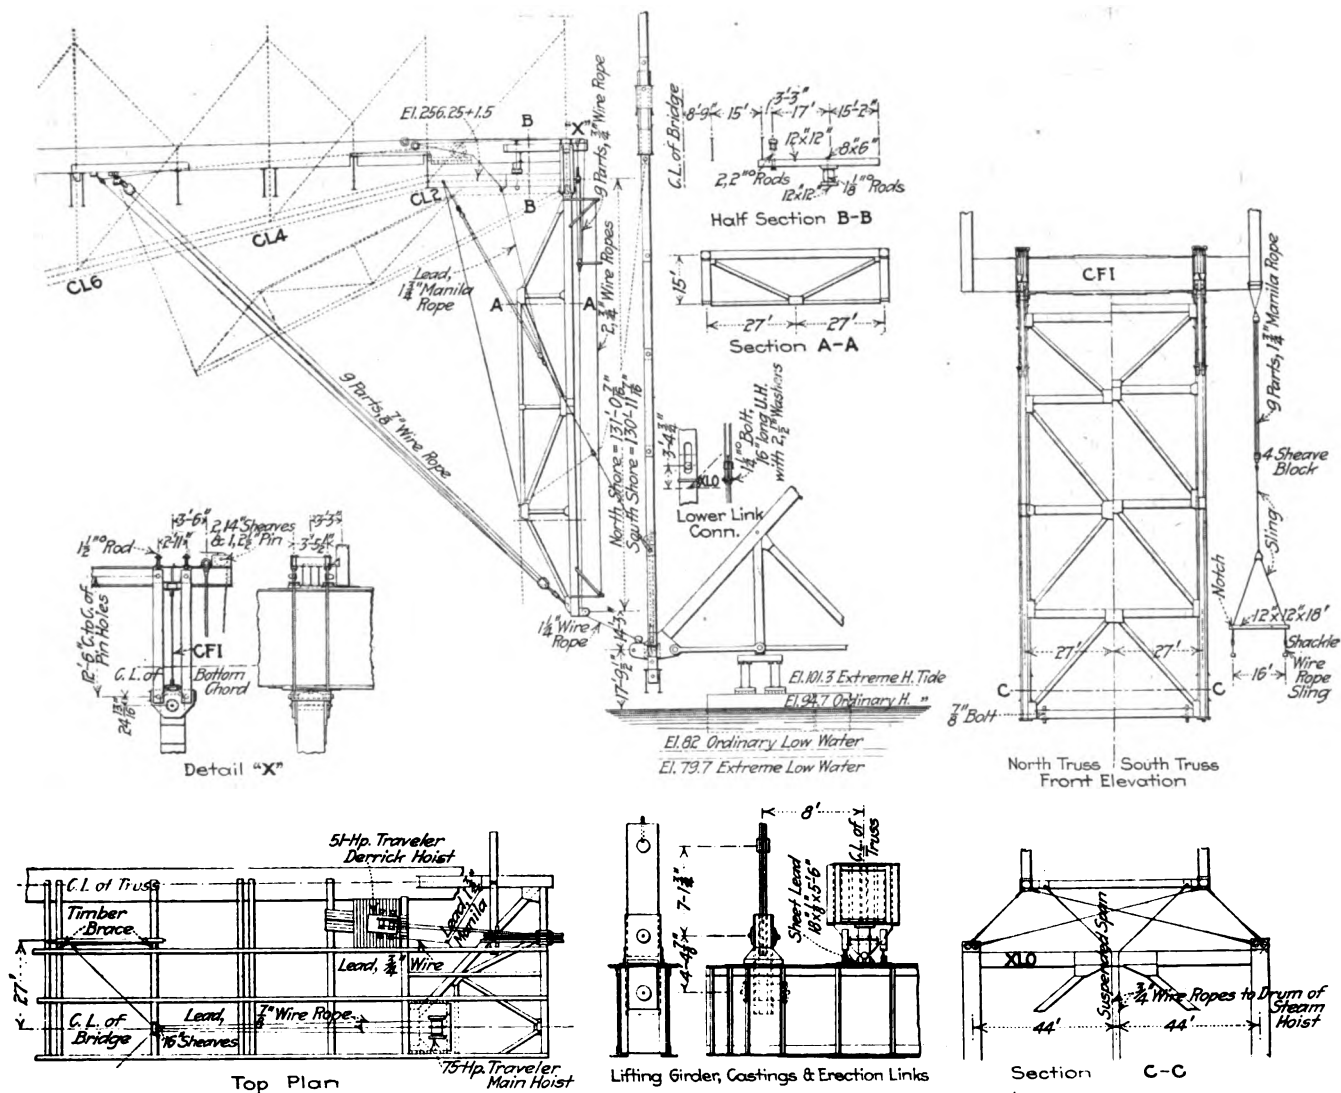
DETAIL OF ARRANGEMENTS FOR MOORING AND HOISTING THE SUSPENDED SPAN OF THE QUEBEC BRIDGE
